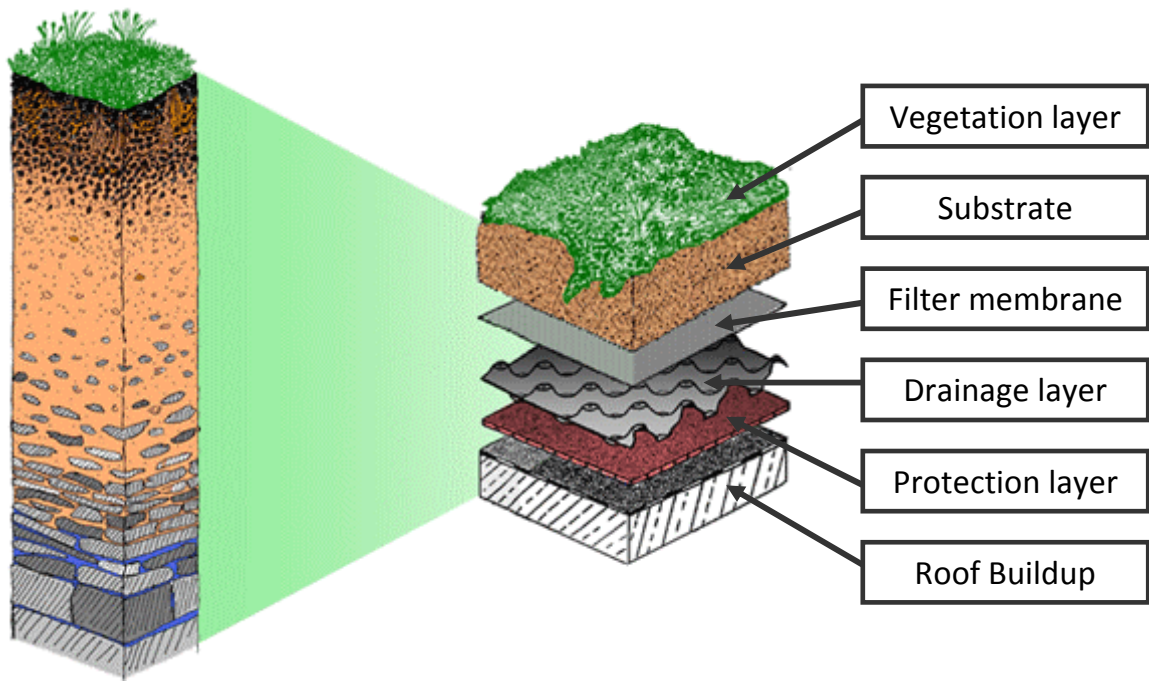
Green Roof Profile. Schematic diagram of a typical soil profile, left, compared to a green roof, right. Each layer of the green roof functions to manage stormwater and protect the building beneath the roof from intrusion of roof components (Image courtesy ZinCo-USA).
